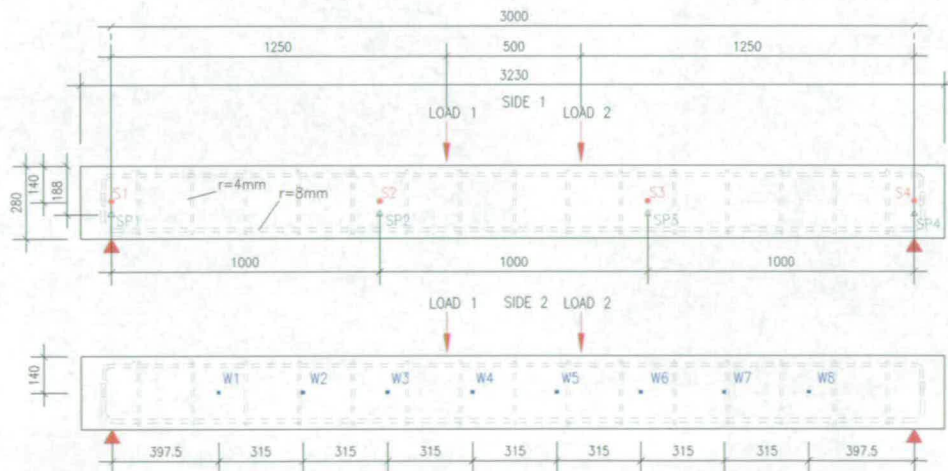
Design details, test configuration and sensor location (resonant: S1 to S4 - broadband WD type: W1 to W8 - SoundPrint: SP1 to SP4) of beam BF6.
